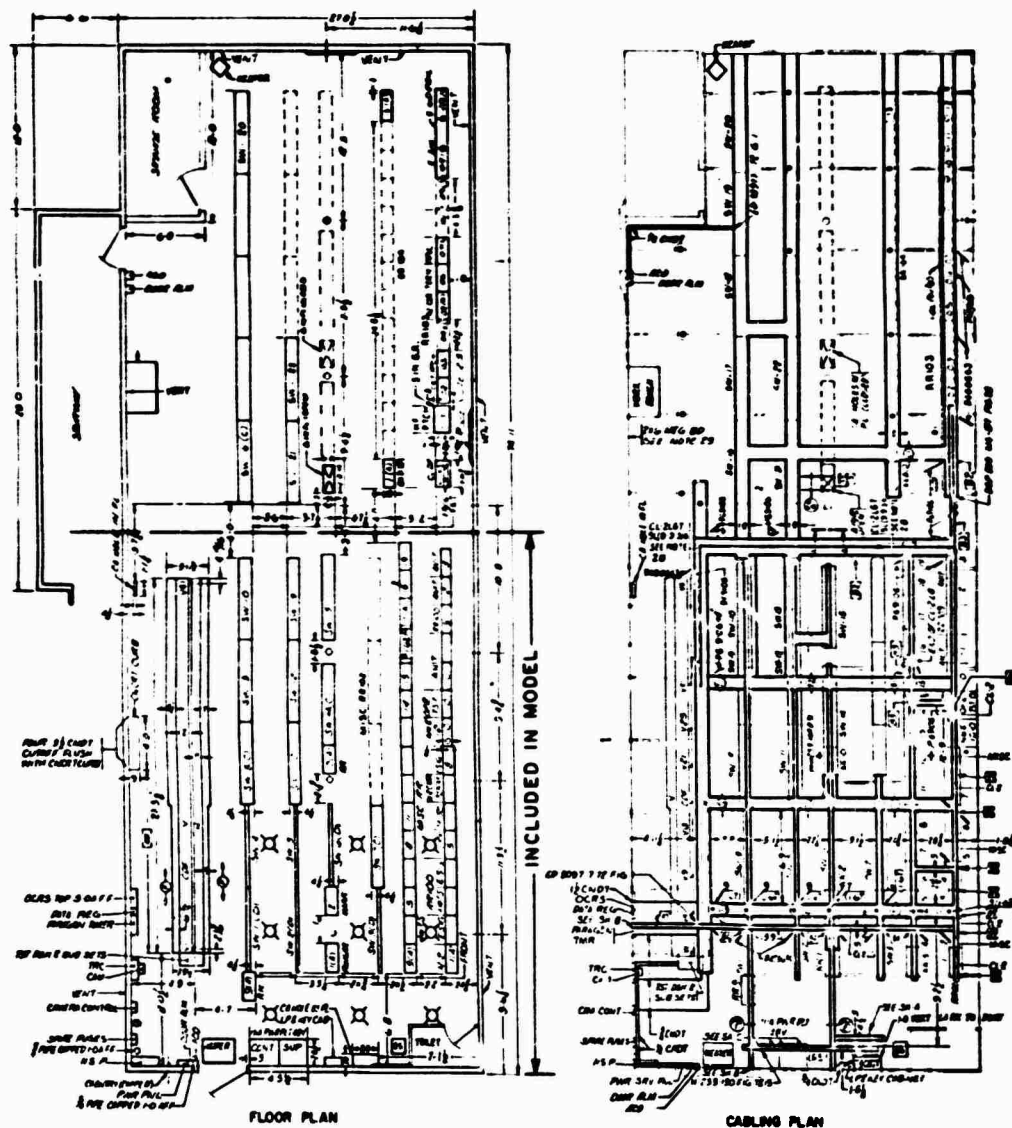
Floor and Cabling Plan of Typical Community Dial Office
